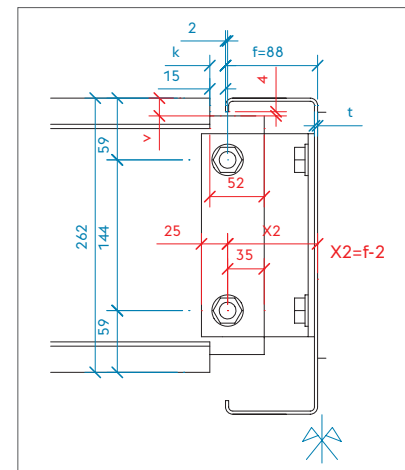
Example of a connection of a floor beam made of 262C+15 to a girder made of 302M25
